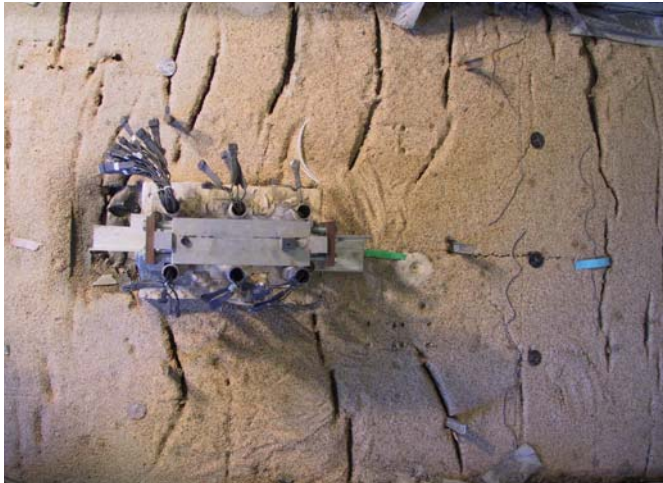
View looking down on a structure after shaking. Notice the ground cracking as the ground spread laterally (from the top of the photo toward the bottom) due to liquefaction of the underlying layers.
